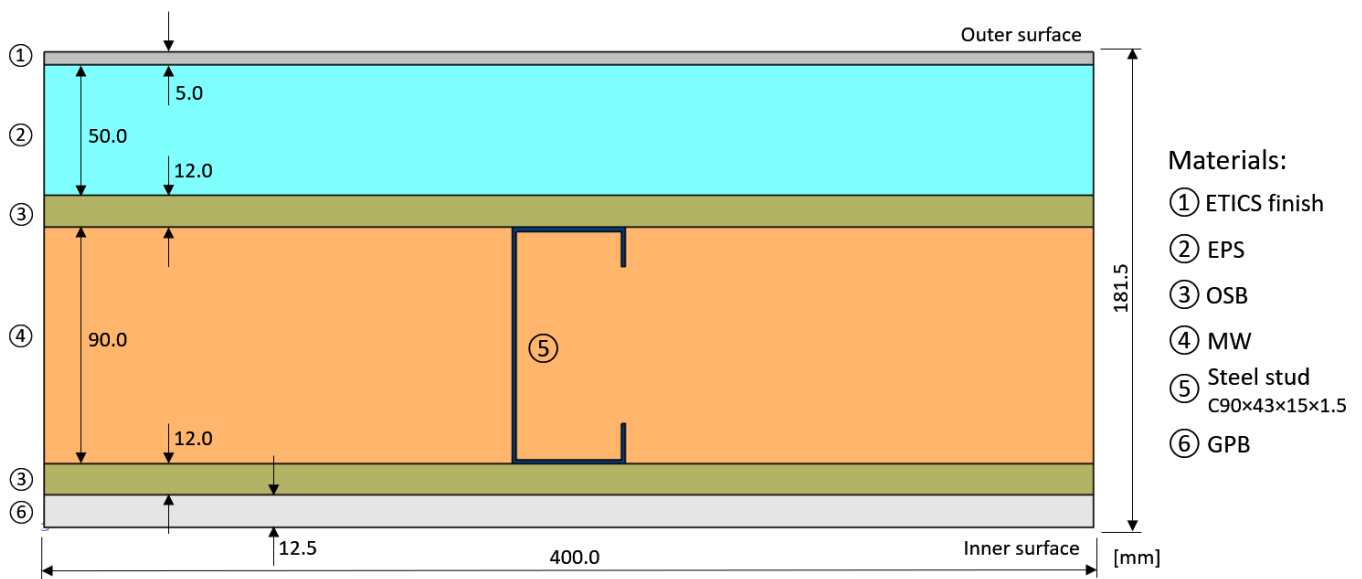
Reference facade LSF wall horizontal cross-section: materials and geometry.
